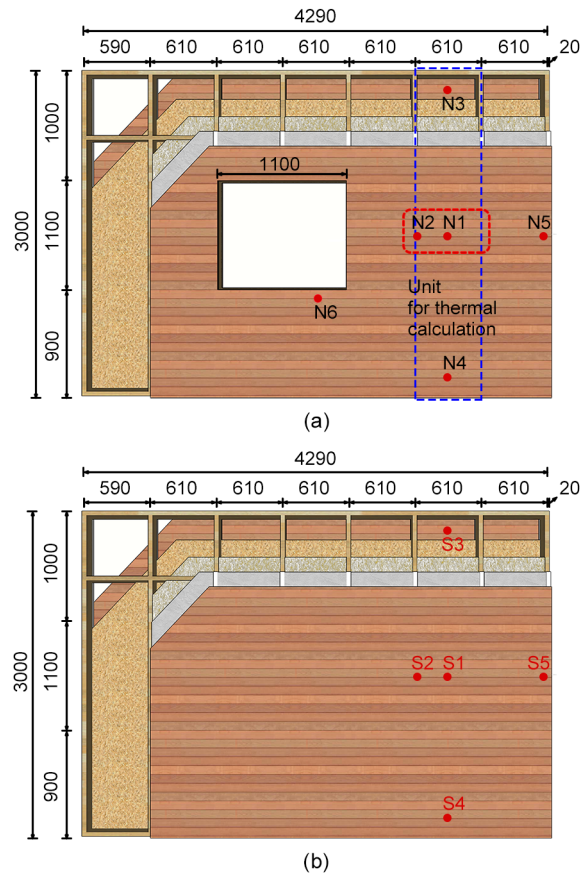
Measuring sites on the wall: (a) northward wall; (b) southward wall (unit: mm)
